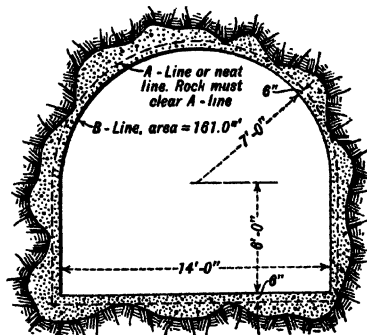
Davis Bridge Tunnel. New England Power Co.
